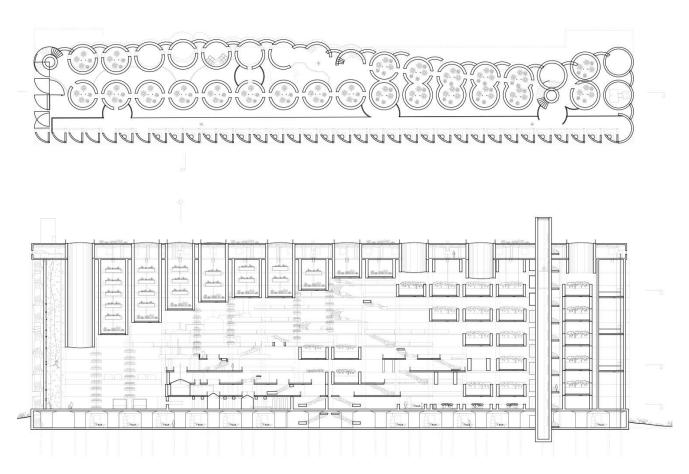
Biofuelry Plan and Section. Brett Rappaport.
